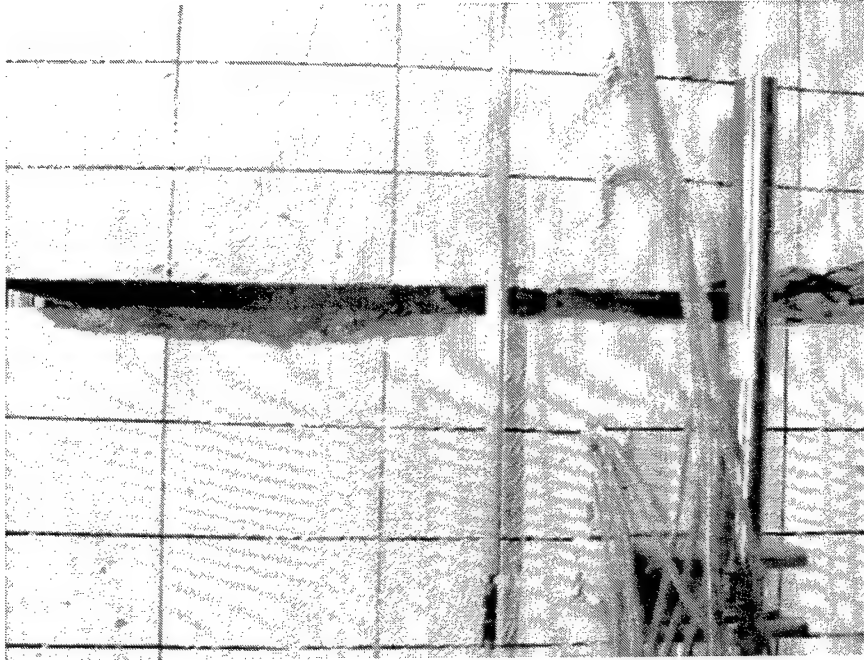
Closeup view of 5SHCL failure plane and rebar
